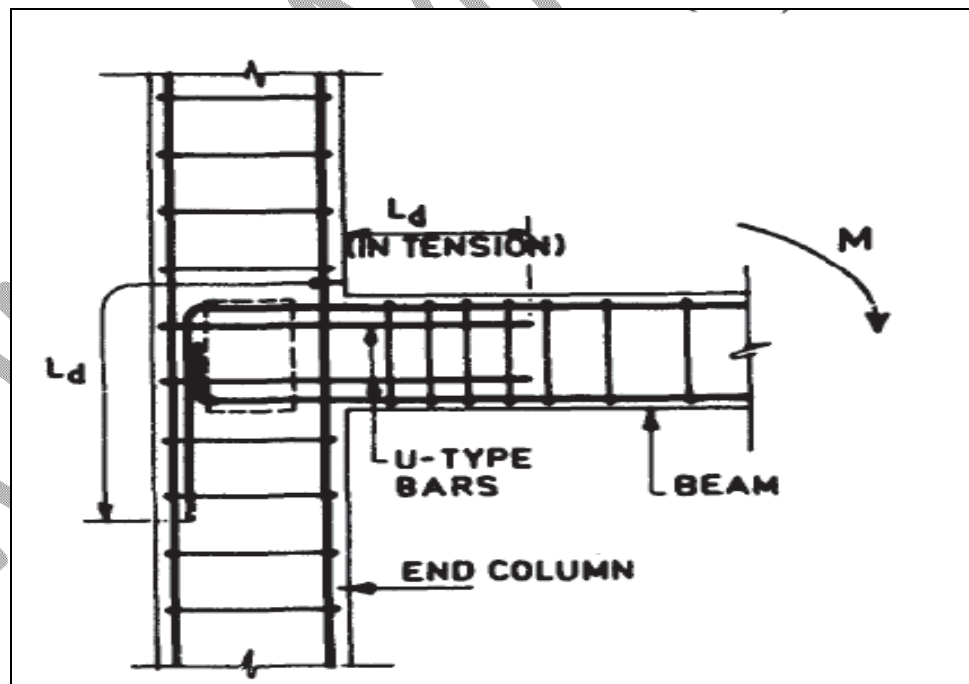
Typical detailing of column beam junction as described in SP 34
